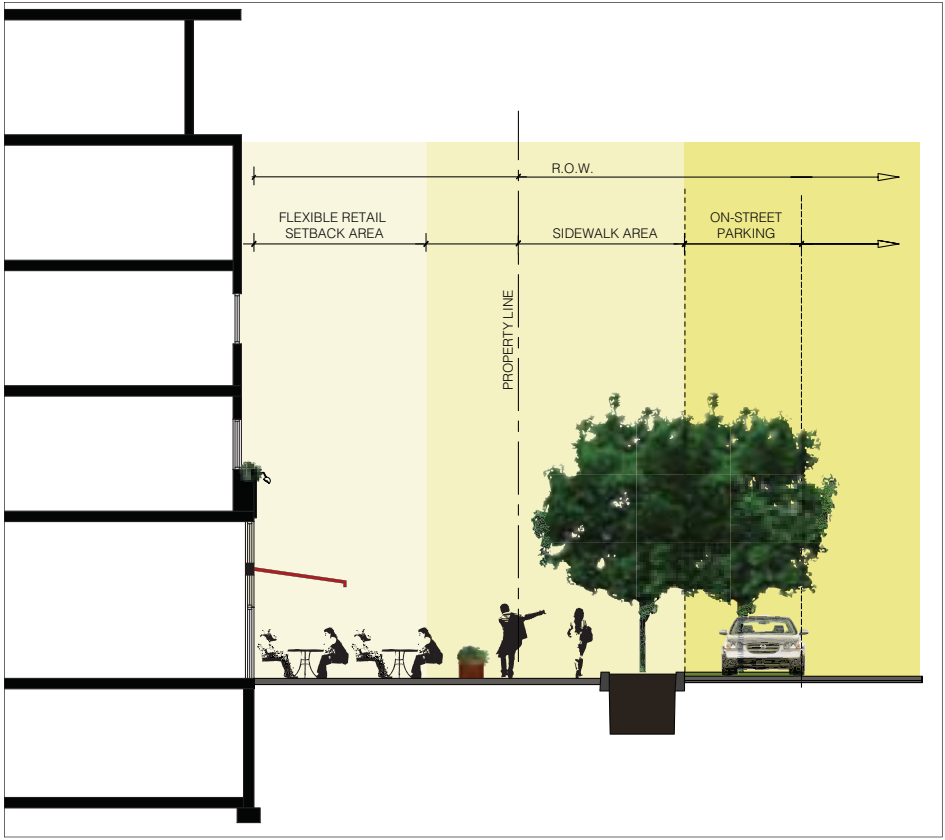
Section illustrating commercial buildings on mixed-use streets where an additional setback beyond the street right-of-way can provide a broad “civic” street boulevard. Trafalgar Urban Core mixed-use frontages will benefit from this treatment.
